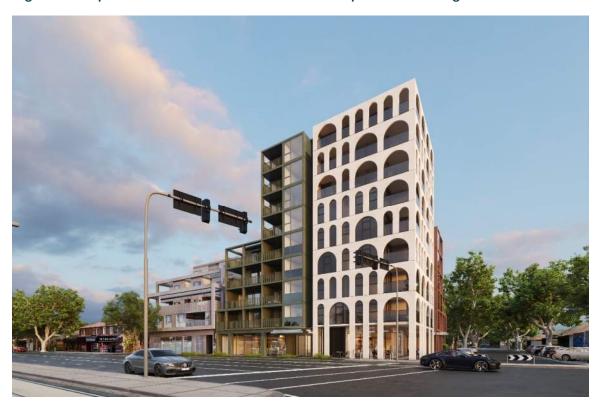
Proposed 3D Render of Amended Development looking south on Brighton Road
